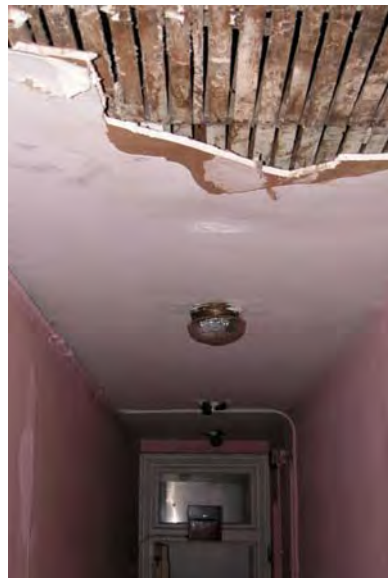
Ceiling at Room 102 (Photo: BBB, 2006)
